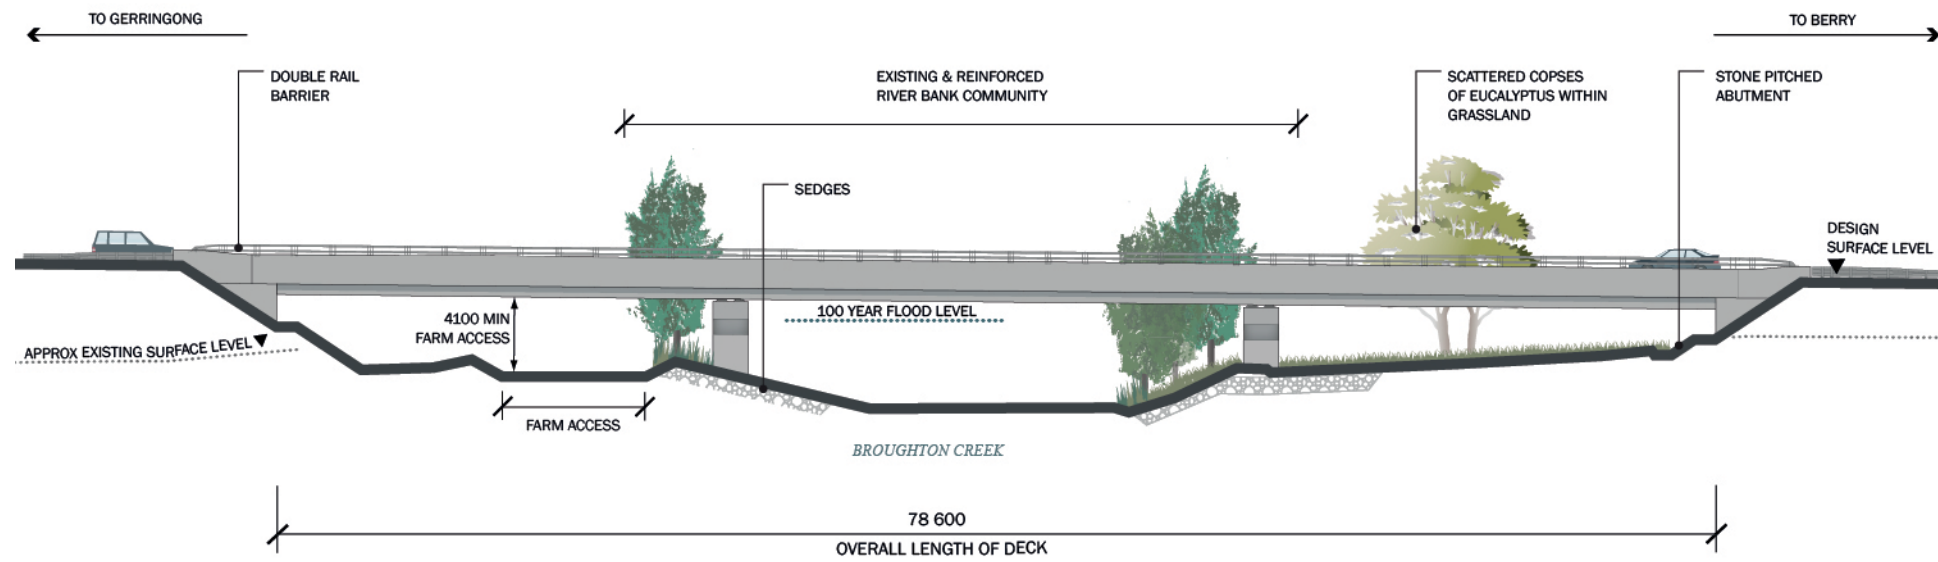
Elevation – Bridge SB03: Broughton Creek Bridge No. 2 (Scale: 1:400@A3)
